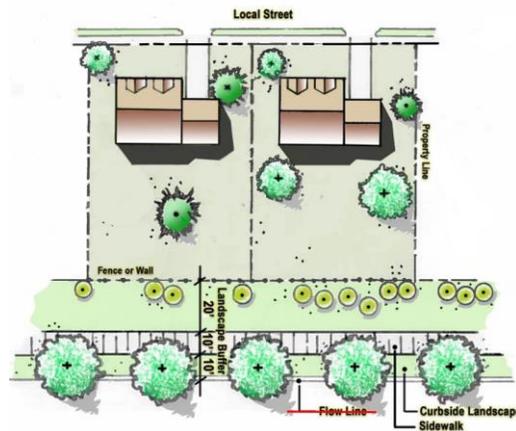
Arterial Street Frontage Buffer Measurement Detached Straight Walk
